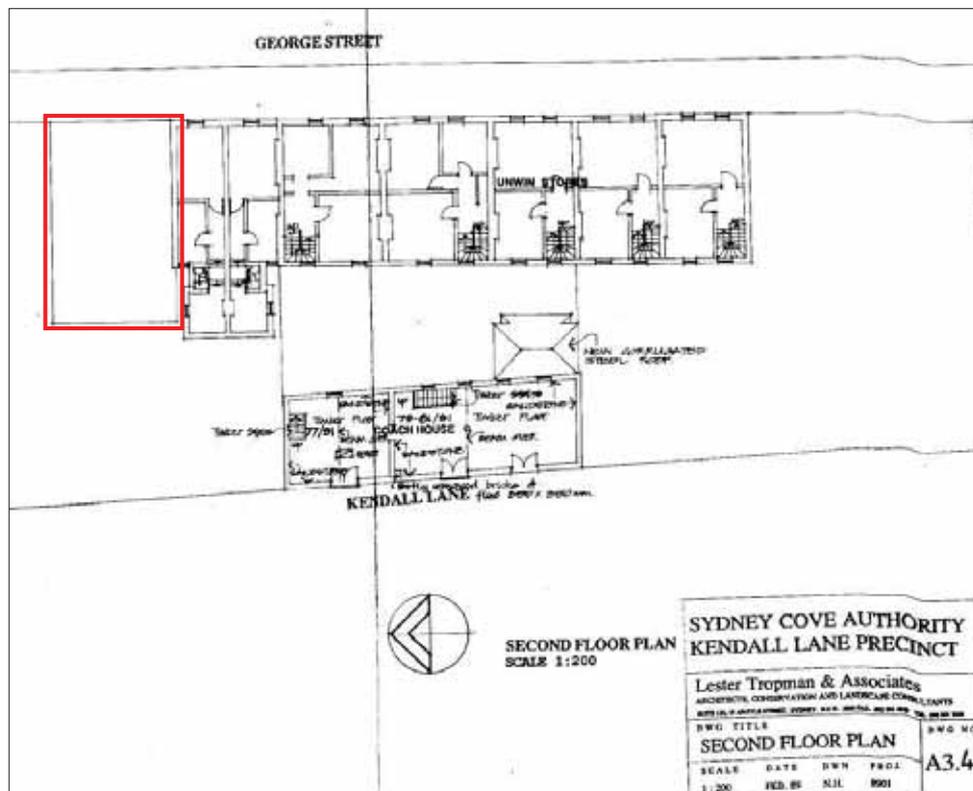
Second floor plan from 1989 project. Subject site is indicated.
